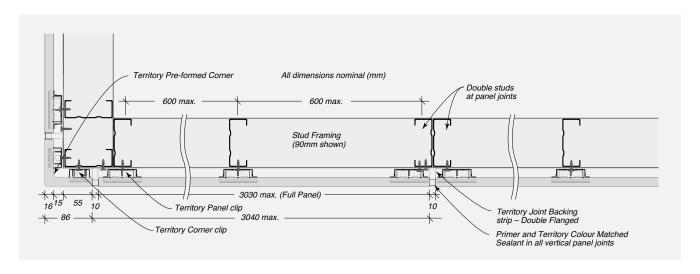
Typical Framing Set-Out with 75mm Steel Framing and Territory Pre-formed Corners – Plan View
